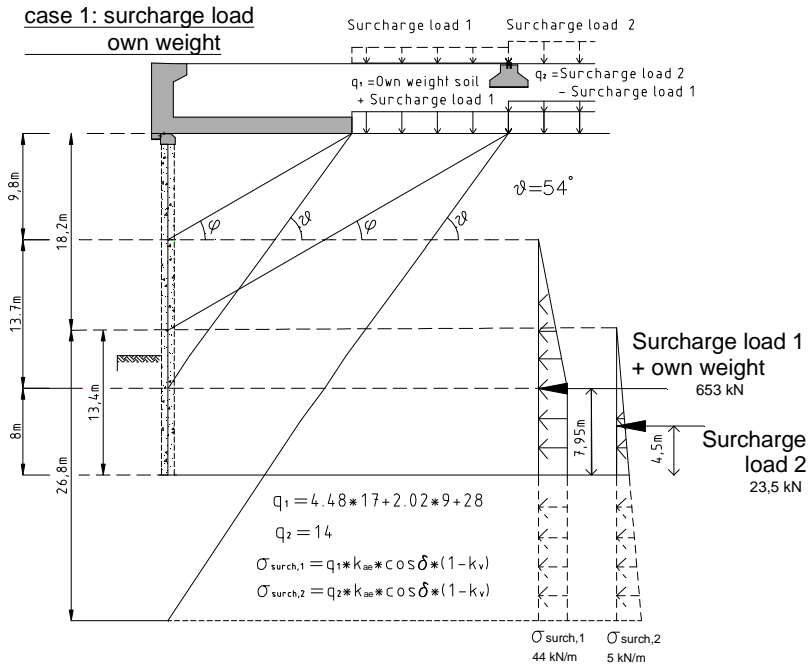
Horizontal ground pressure as result of surcharge load and own weight behind relieving structure
